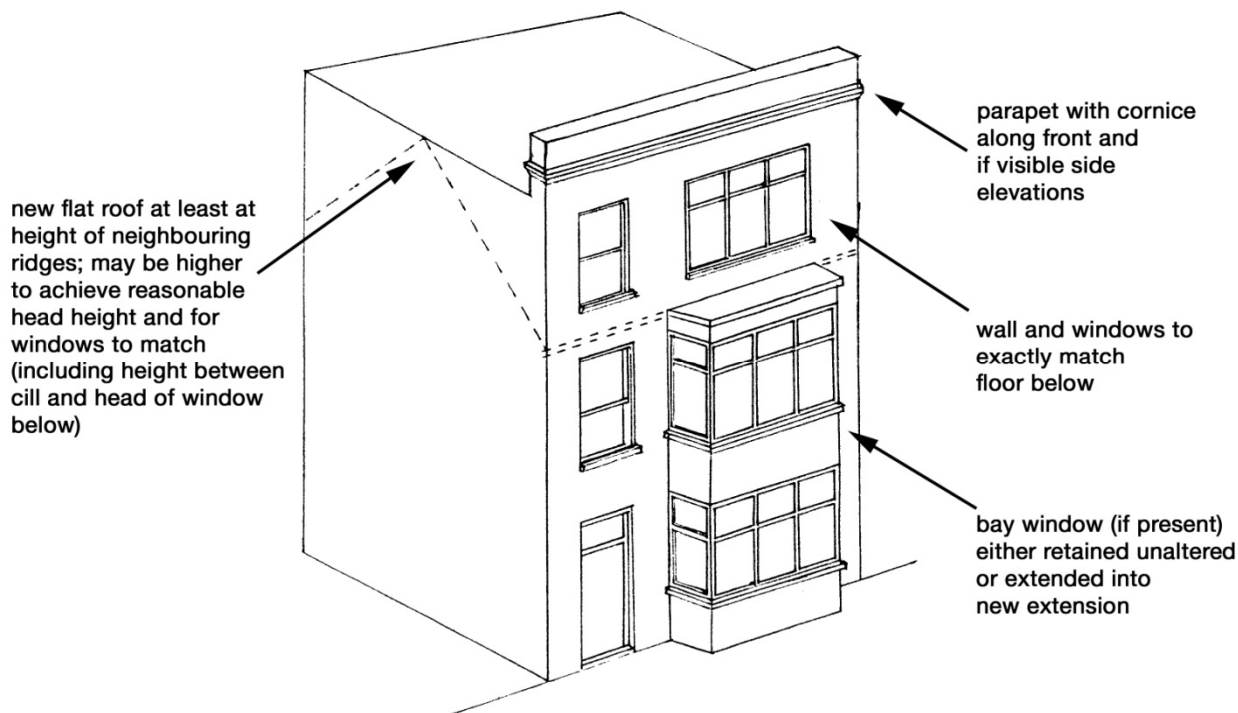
; Type 2; whole floor extension with flat roof behind parapet in wall to match existing 1<sup>st</sup> floor construction; diagrammatic view of single house.
